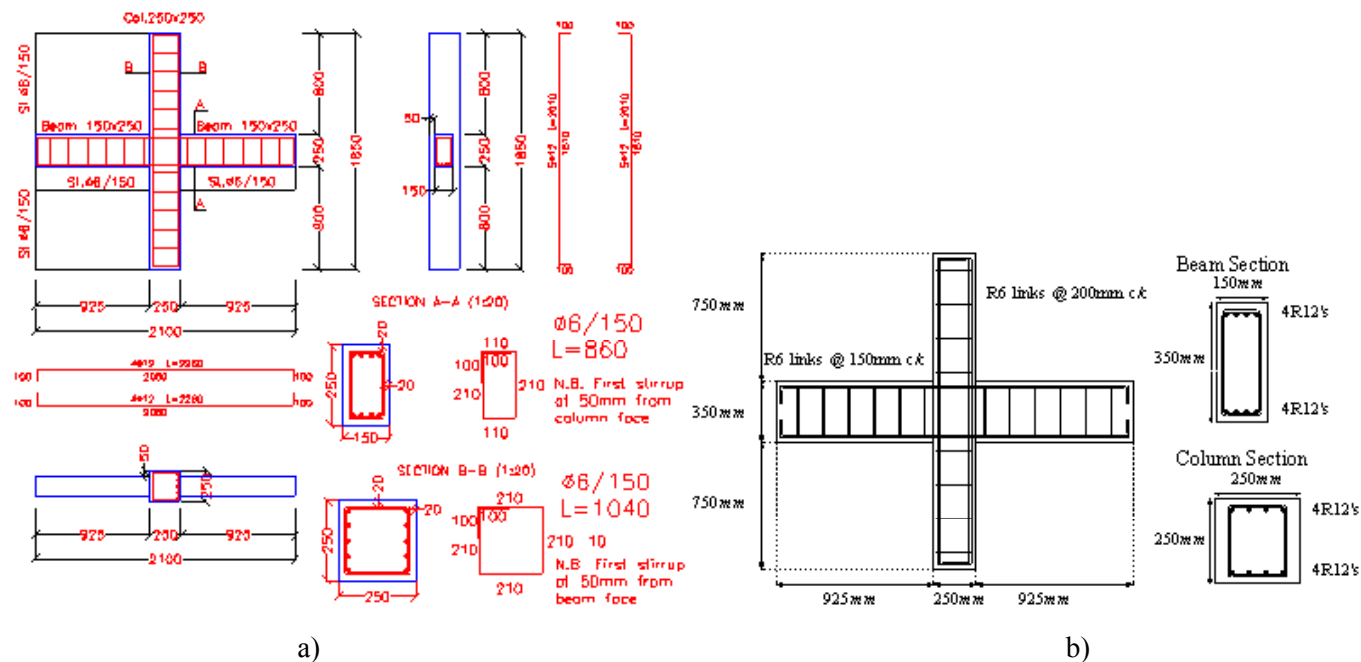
Geometry and construction details for the specimens: a) WB configuration; b) SB configuration
